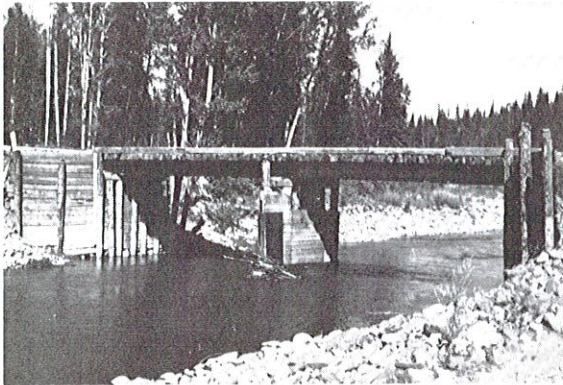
PERMANENT TIMBER BRIDGE. Steel I-Beams are used for stringer and a steel plate has been placed on the pier to deflect debris and protect the pier. Regular maintenance would ensure the removal of debris built up around the pier.
